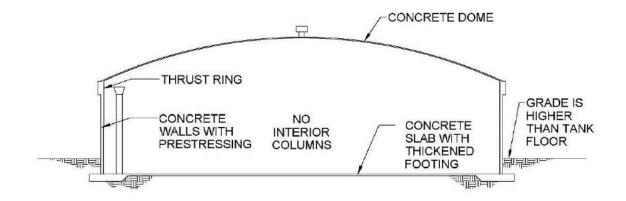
Prestressed Pre-cast Concrete Tank with Dome Roof
